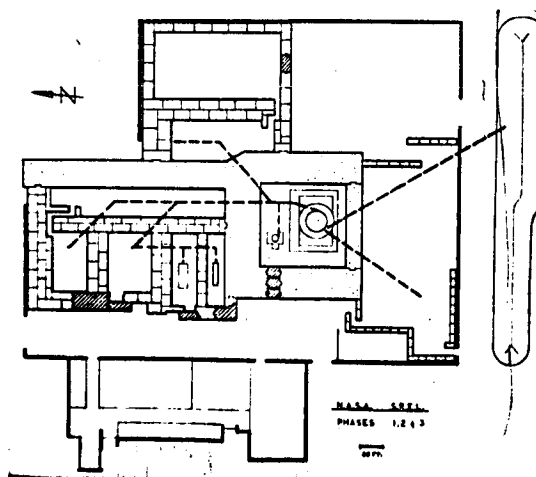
Plan layout of SREL facility showing additional proton experimental area.
